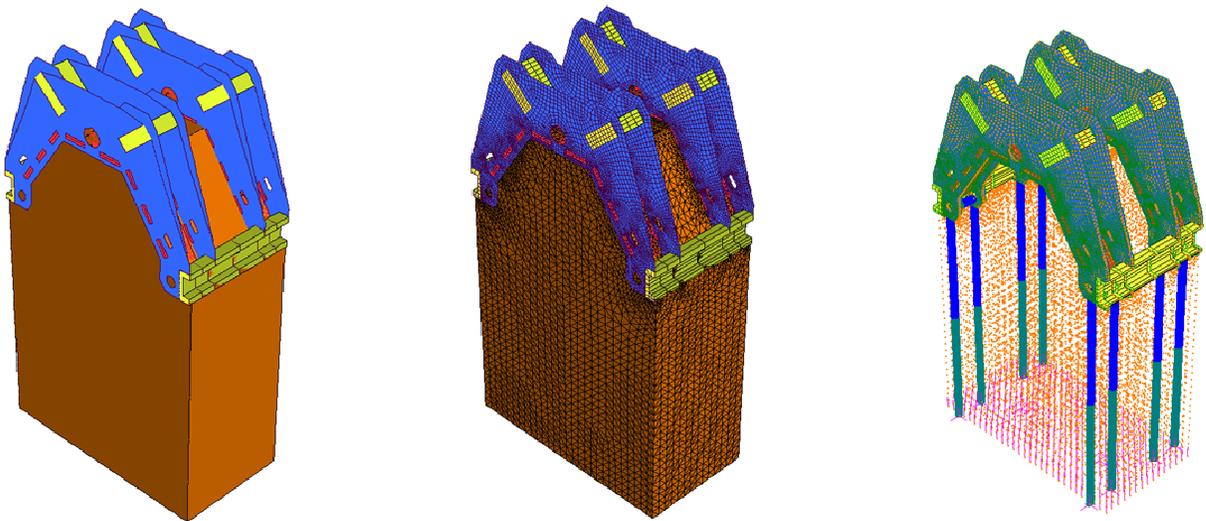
Three-dimensional modeling of the connection and of the segment of concrete columns; on the left, only the steel parts (plates of the frame and longitudinal bars) are represented.
